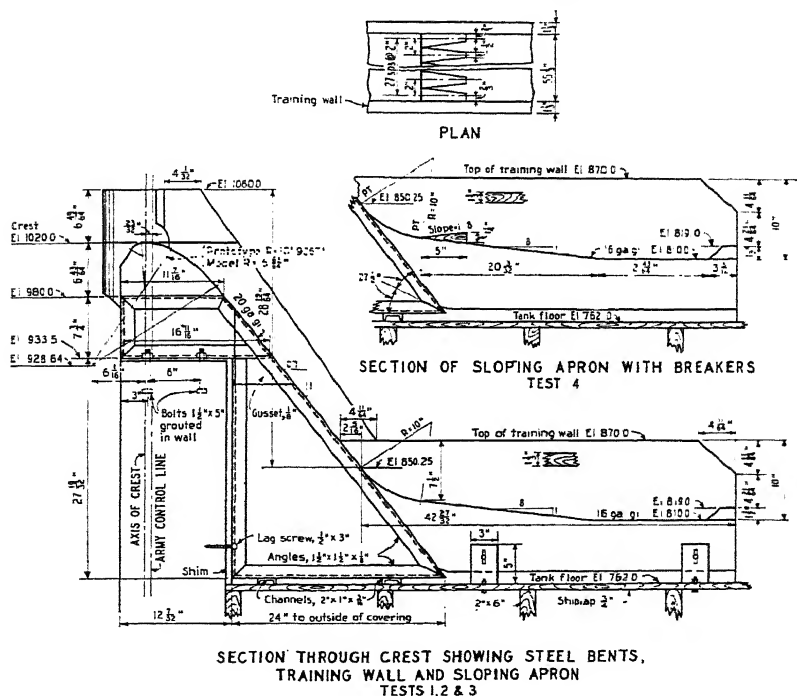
Model 8:1 slope, apron at elevation 810, sill at elevation 819.
